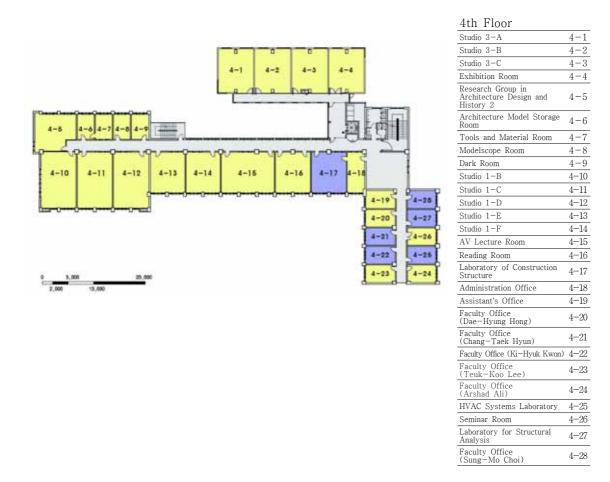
Key Plan of the ACB and the ASA: 4th Floor
